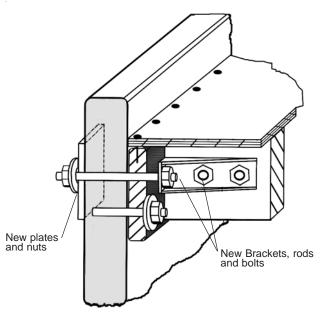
Strengthening Wall Anchors. One of several ways to strengthen the connections between the roof and floor joists and the walls is to install brackets and rods that go through the walls and attach to the joists.
